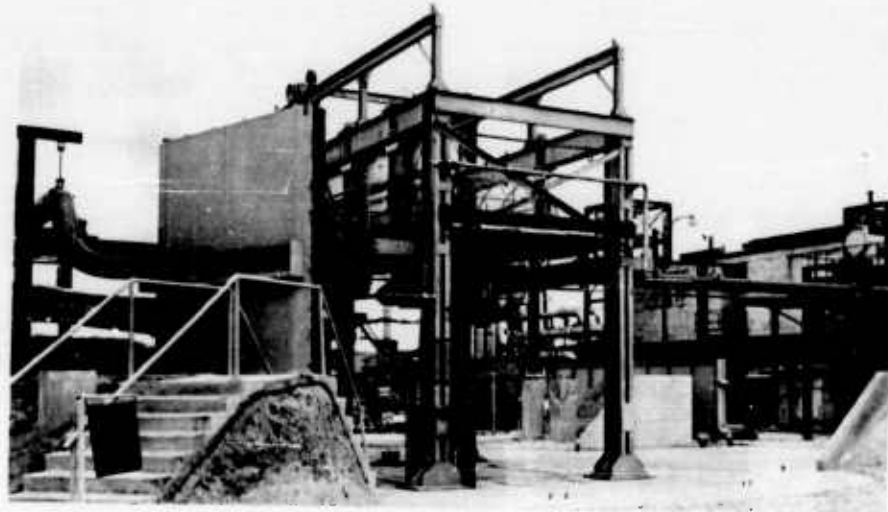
VIEWS OF FAN INSTALLATION AFTER REMOVING FACILITY WALLS
